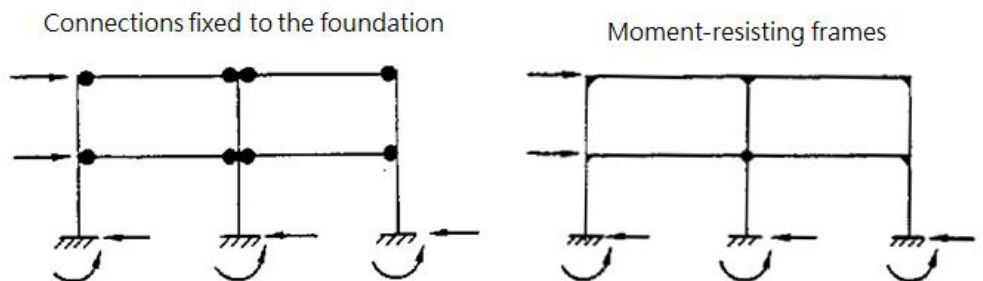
Stability systems for low rise buildings (left) connections fixed to the foundation (right) moment resisting frames
